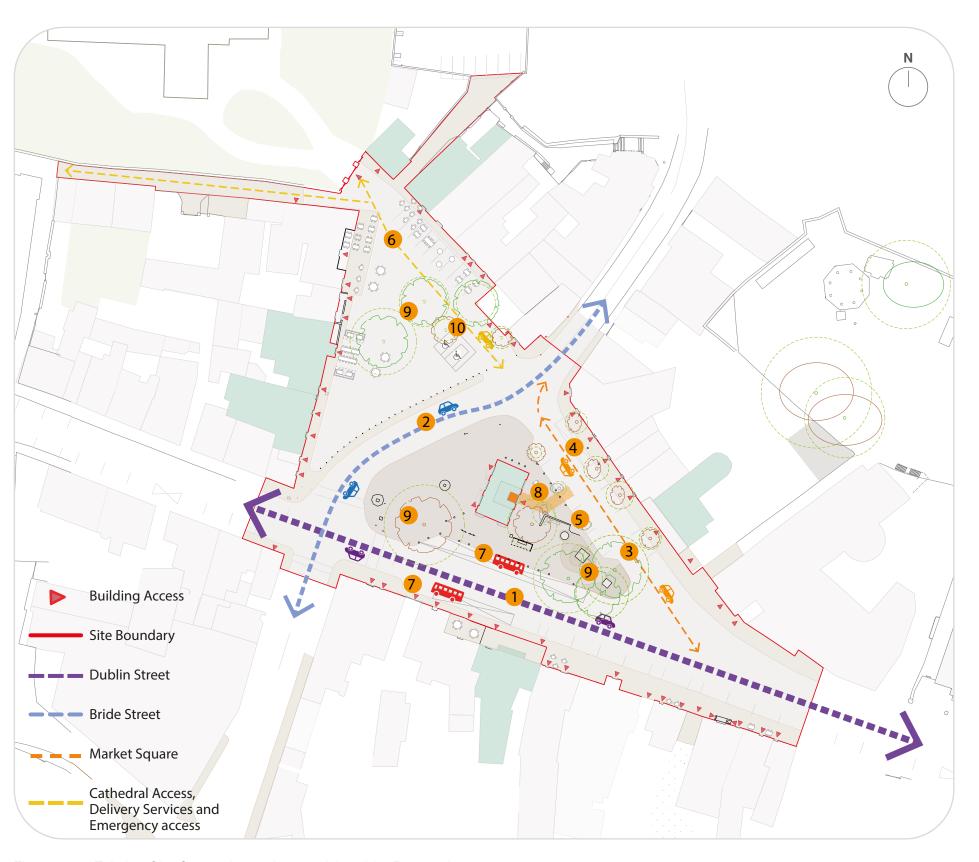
; Existing Site Constraints to be considered for Proposal Please refer to Traffic and Transport Assessment and Civils report for Further Detail on roadways
